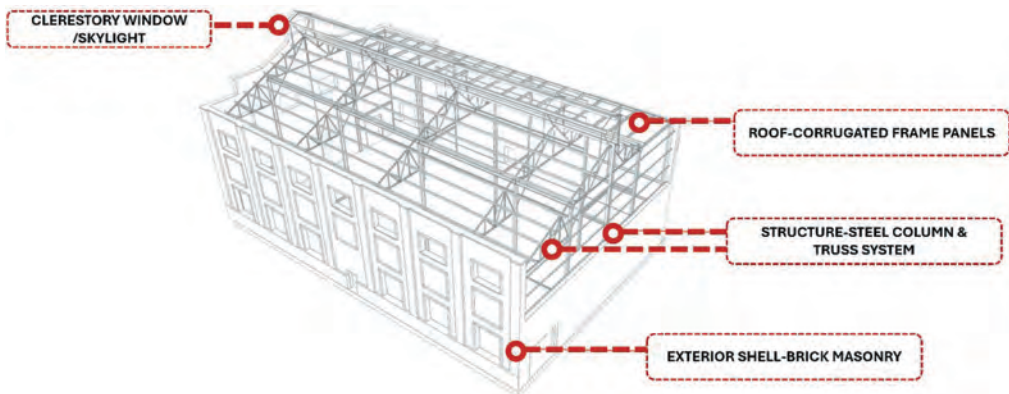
Area 3 - structural frame (3-D frame by Authors).
